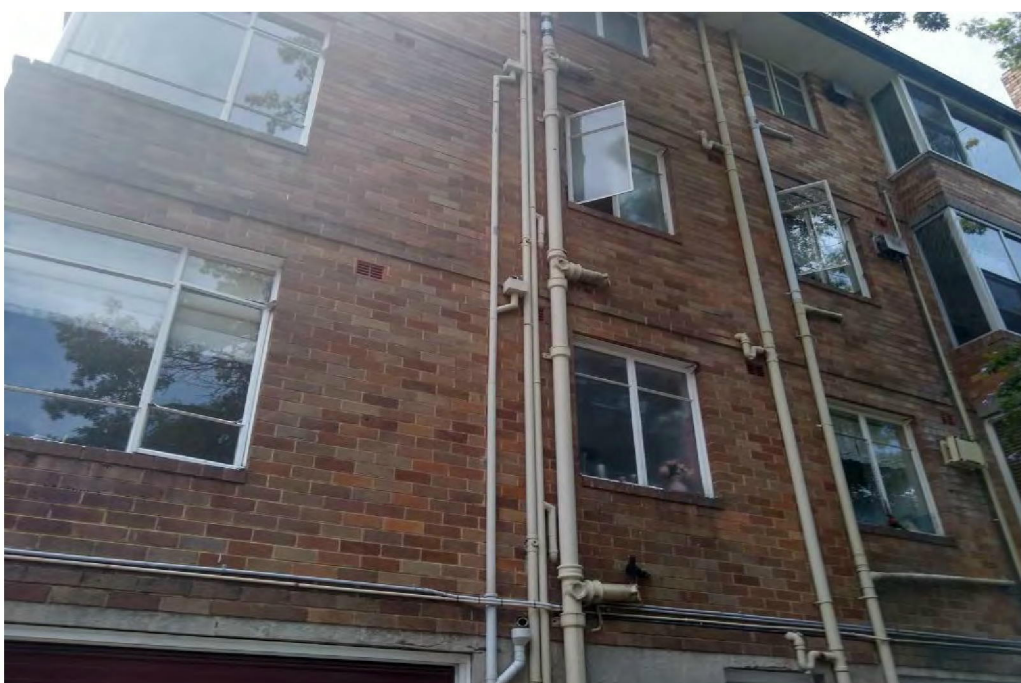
Pipes along northern side of 44 Anderson Street (SP80201)
